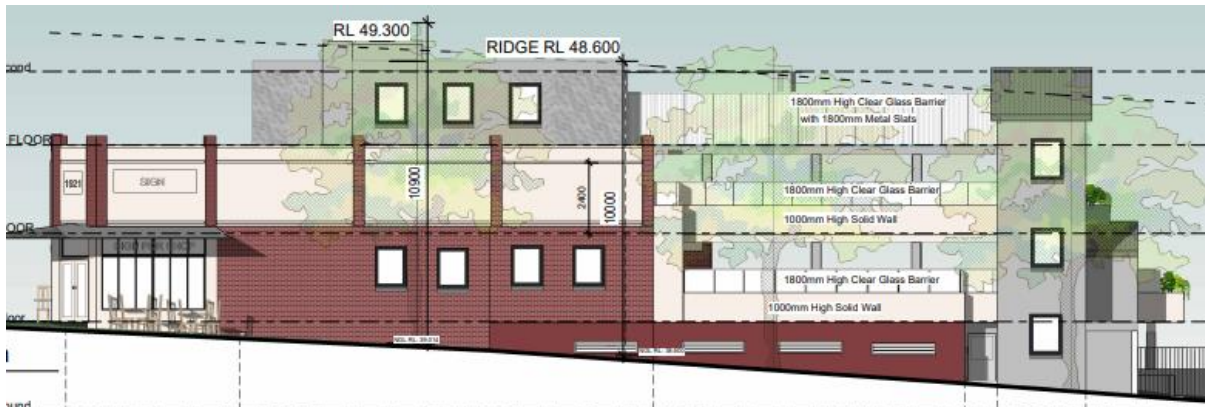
Southern Elevation Plan depicting the appearance of the previous proposal from Arthur Street with an FSR of 1.49:1
